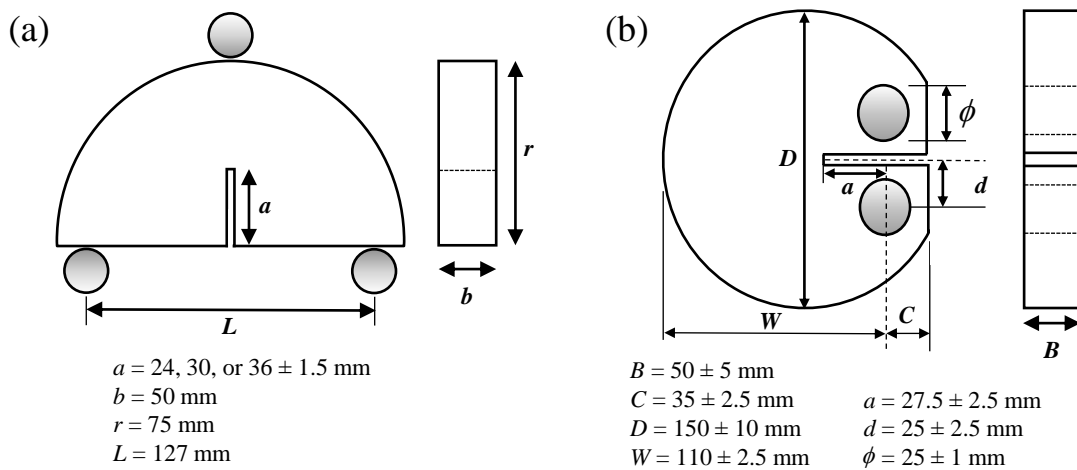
Schematic and dimensions of (a) SCB and (b) DCT specimen
